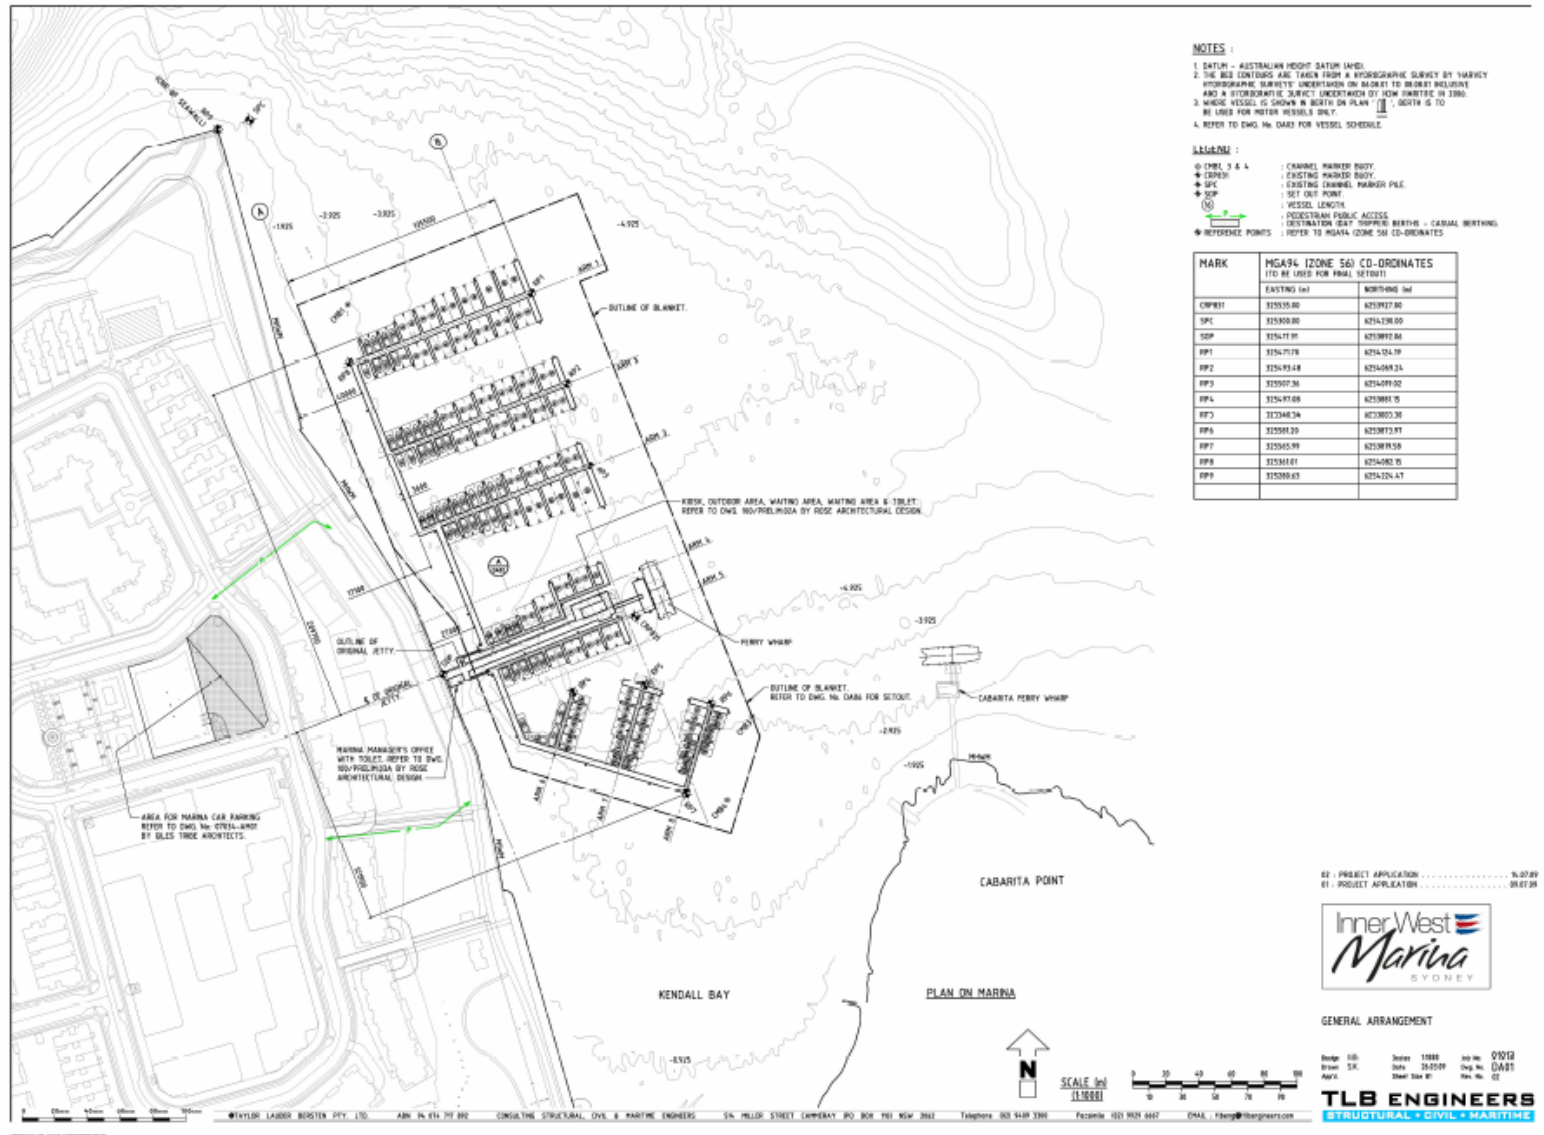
Site Plan for the proposed Inner West Marina development, Kendall Bay, Sydney (from TLB Engineers).
